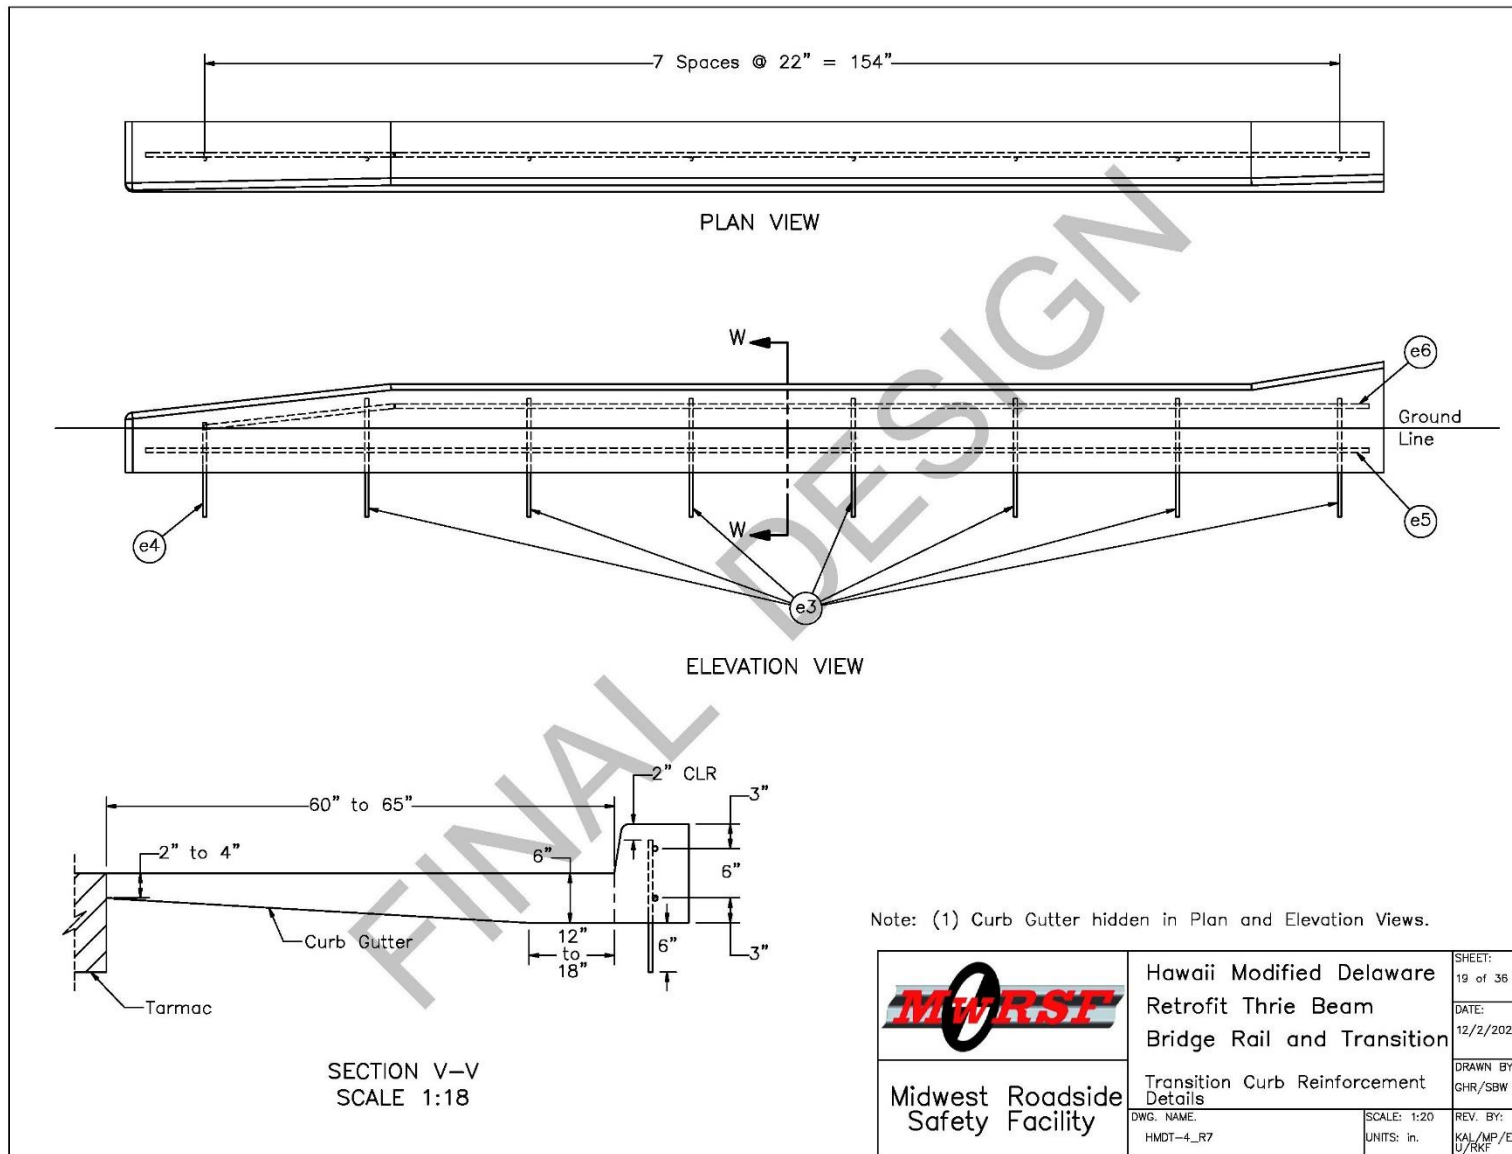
Transition Curb Reinforcement Details, Test No. HMDT-4
